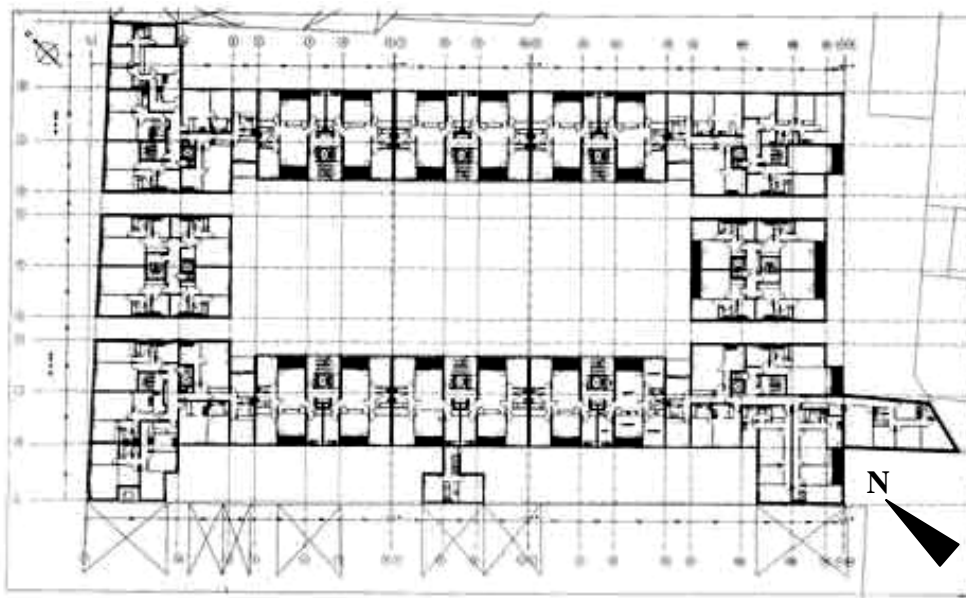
Rue de Meaux housing block – ground floor plan
